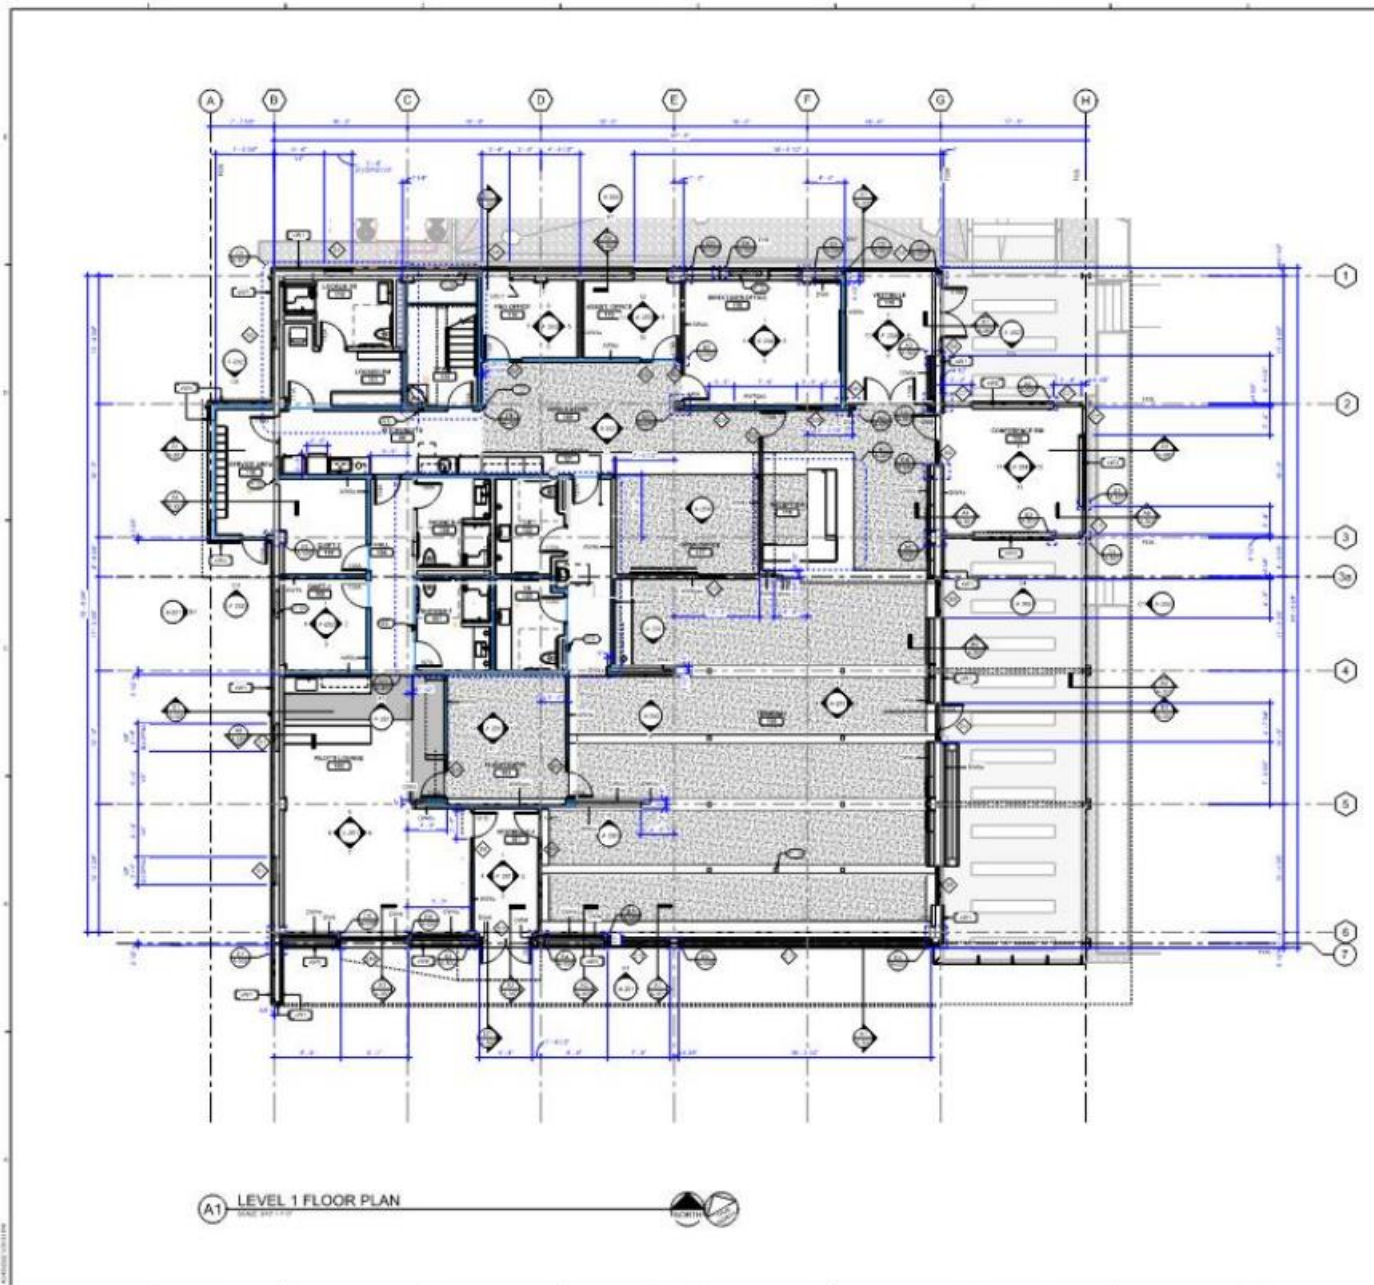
Conceptual design of the floor plan of the rehabilitated structure (Proposed Action)
